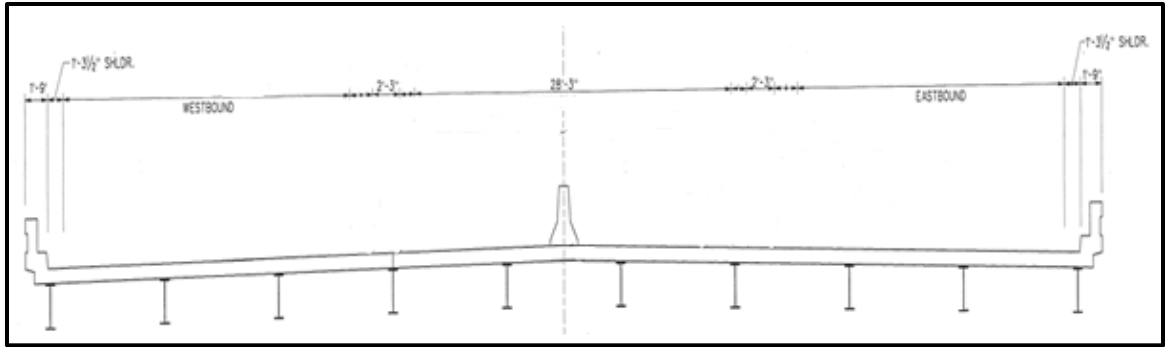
Hernando DeSoto Bridge Cross-Section
